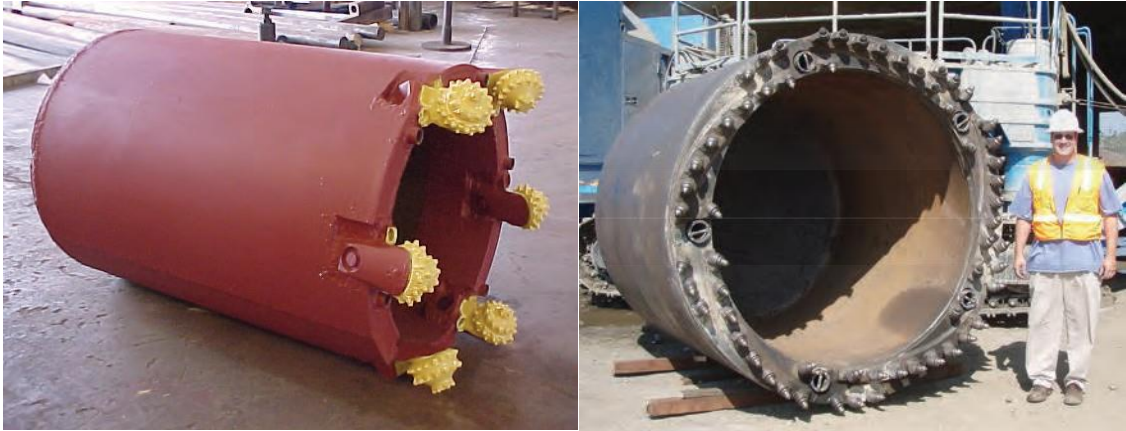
Examples of double wall core barrels (FHWA, 2010).
